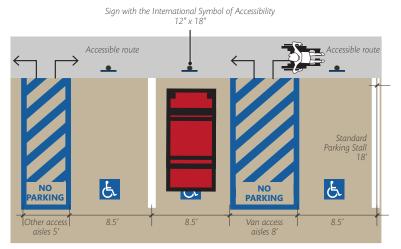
ADA Accessible Parking Stall and Access Aisle Dimensions
